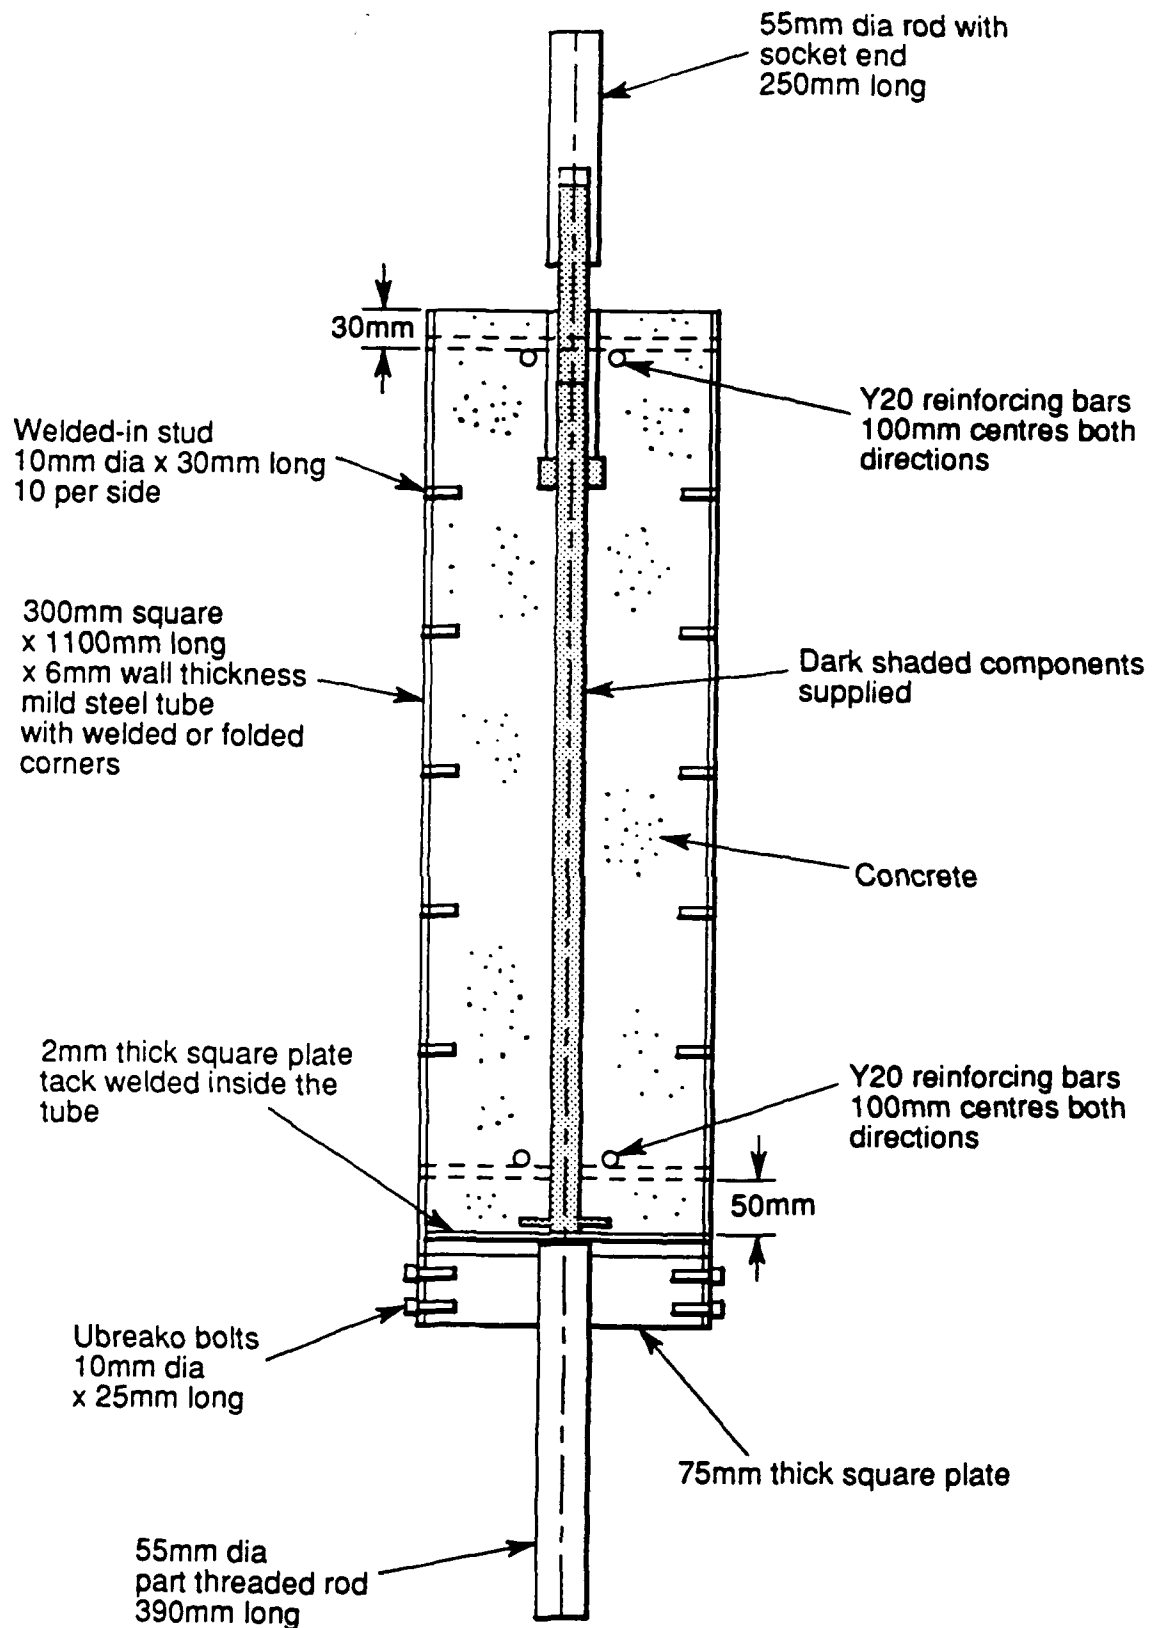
FLOOR ANCHOR SPECIMEN GENERAL ASSEMBLY.
